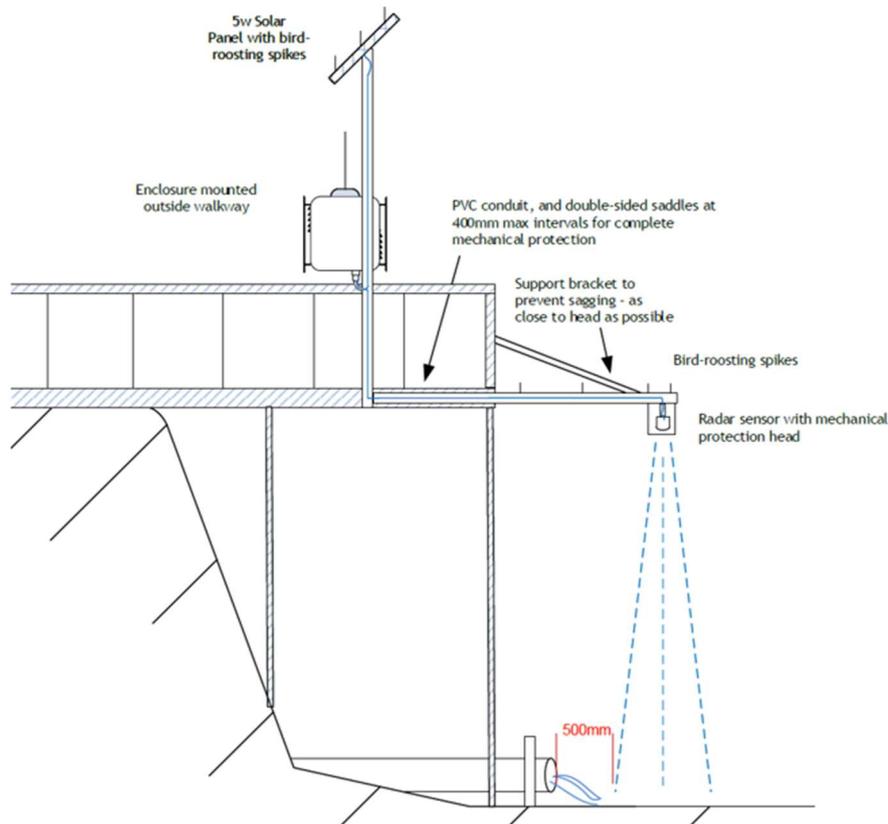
Installation type 1 storage meter - elevated platform with a radar sensor for storage metering.
